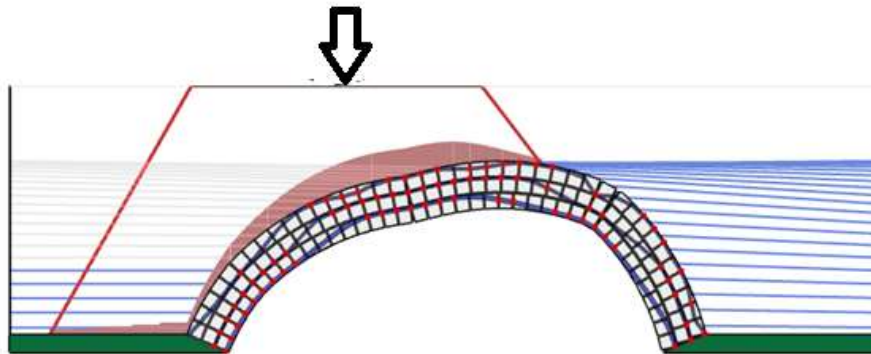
Collapse mechanism for arch loaded by 2 m square footing, column position at arch left quarter-span.
